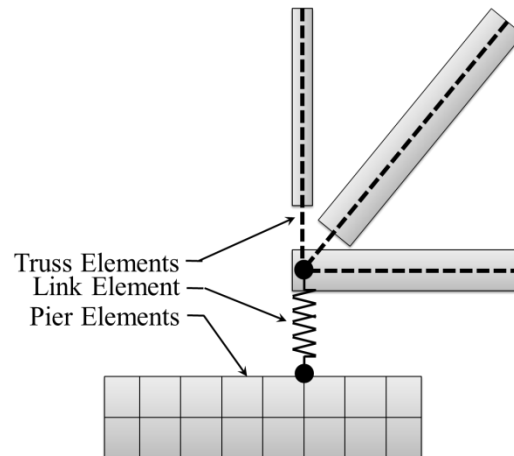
Schematic of Attaching Lift Span Truss to Pier
